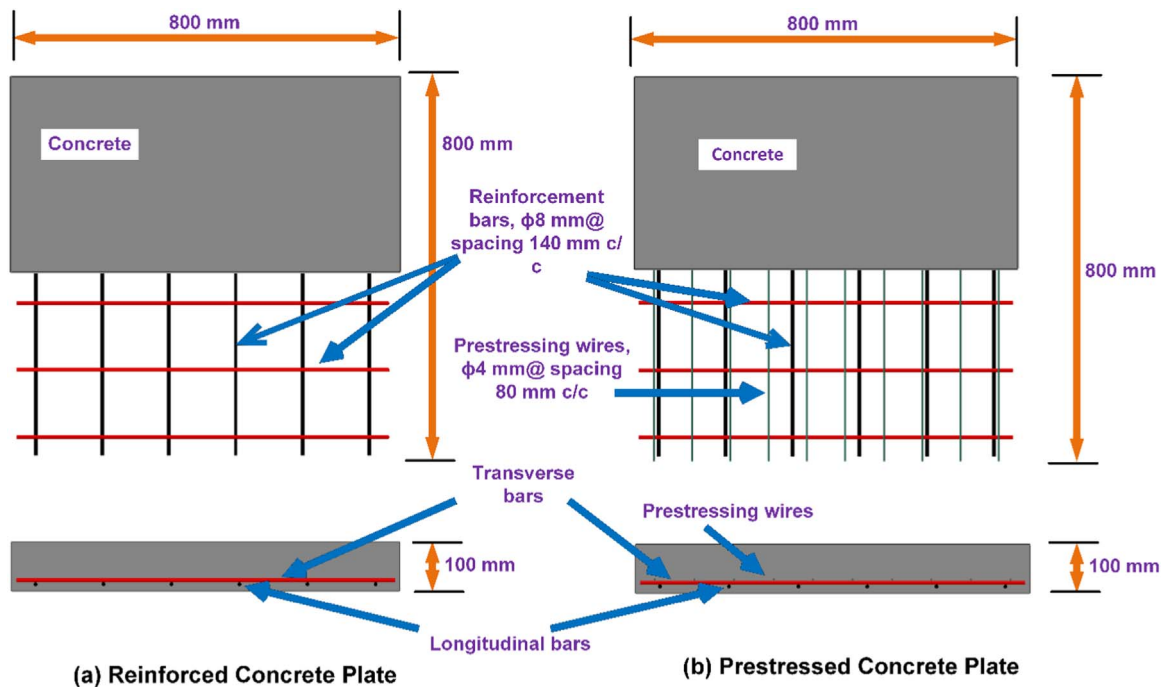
Detailing of reinforcing bars in (a) reinforced and (b) prestressed concrete plate.
